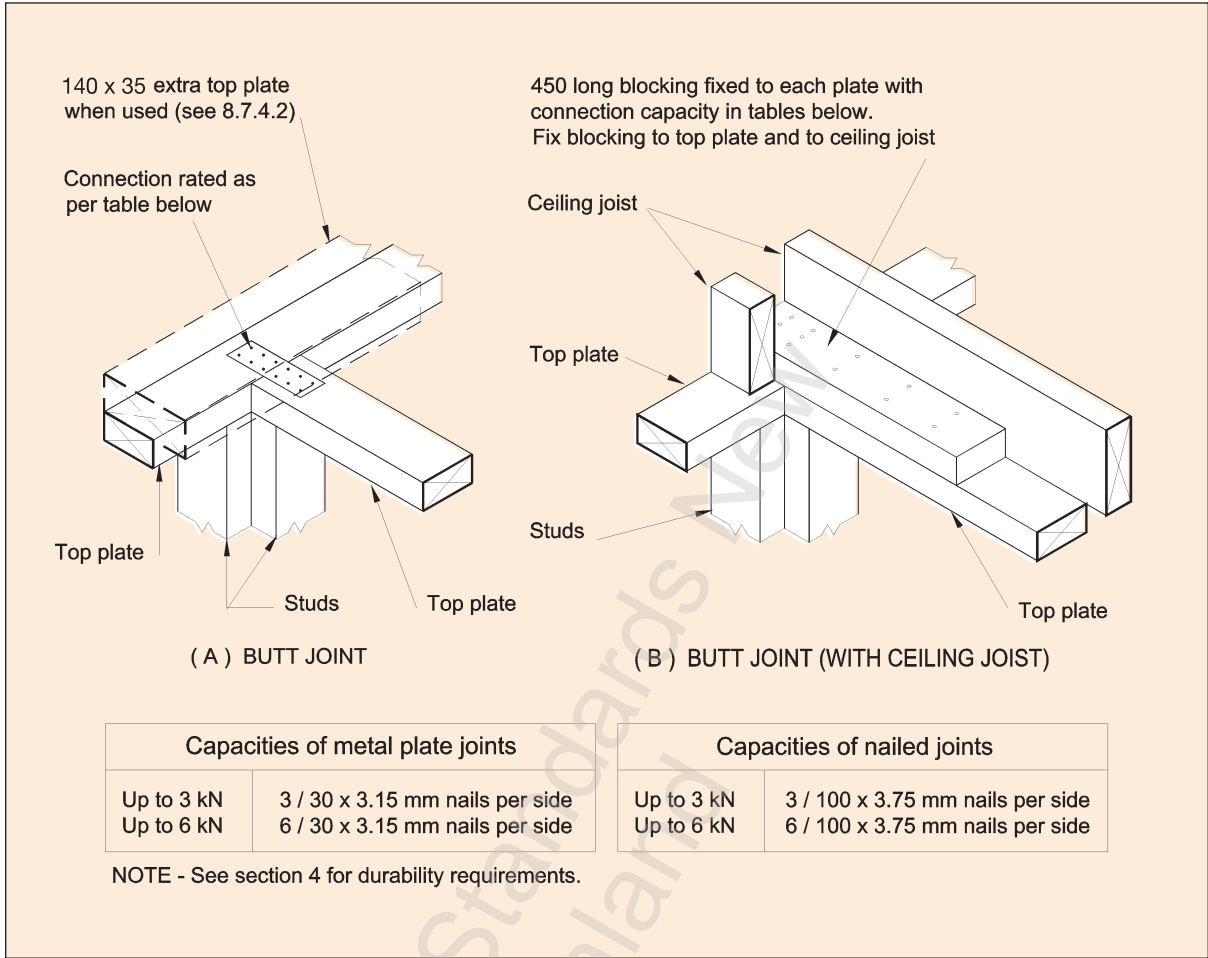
Connecting top plates to external walls at right angles – Walls containing bracing (see 8.7.3.4)
